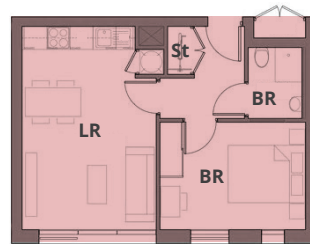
Floor plan of a Pocket flat scale 1:200
